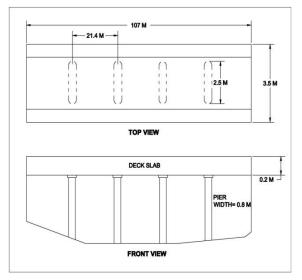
Cad drawing of Kukadi RiverBridge at Ozar
